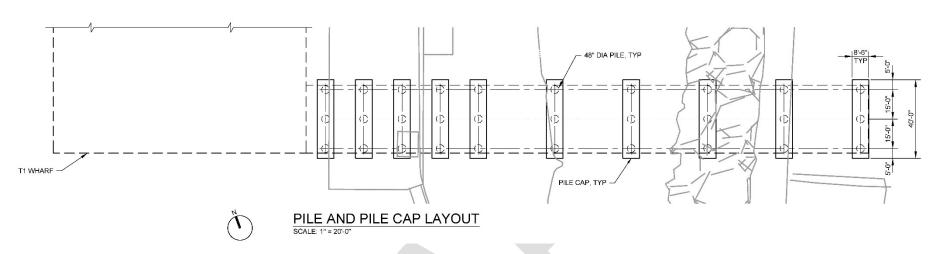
Pile Layout for Terminal 1 Access Trestle: Alternative 1A with 48-inch-diameter Driven Piles
